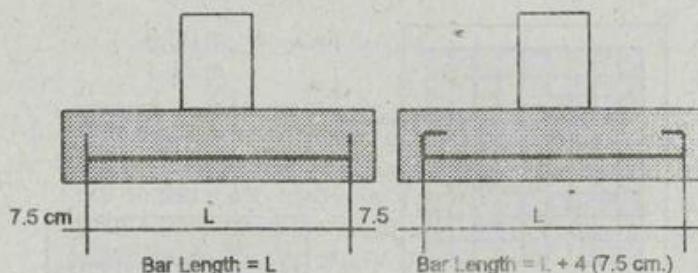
INDIVIDUAL FOOTING REINFORCEMENT
